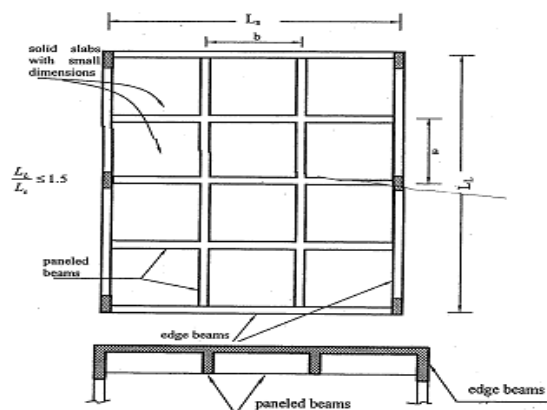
Layout of panelled-beams floor (Ghoneim and Almi Hilmy, 2008)
